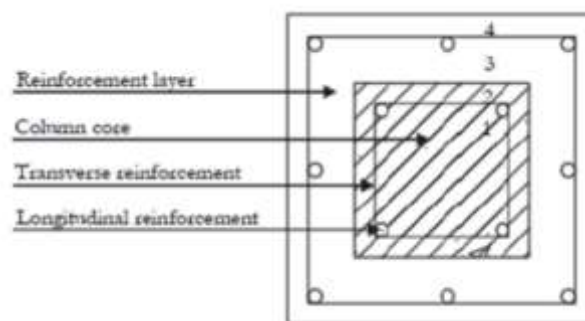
RC Jacketed Column Cross-Section Jacketed Column Cross-Section
